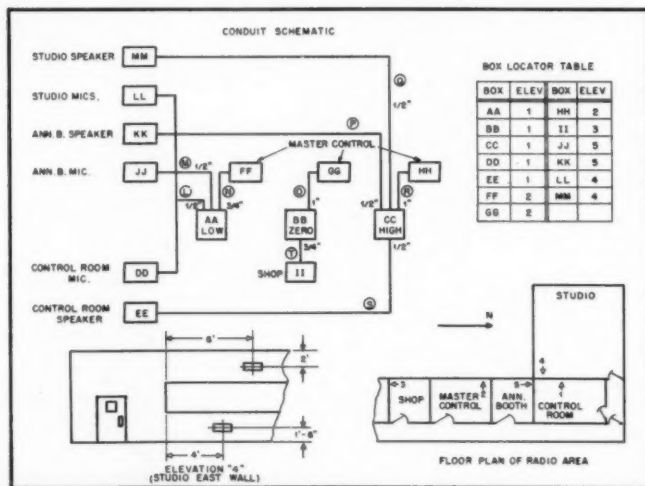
Audio Conduit Layout. Circled letters are individual conduit designations. No medium-level conduits are shown as no medium-level circuits leave the control room. Boxes are surface mounted, and should be dimensionally located in elevations of their respective walls hereon. Floor plan aids in identifying walls and visualizing conduit runs.
